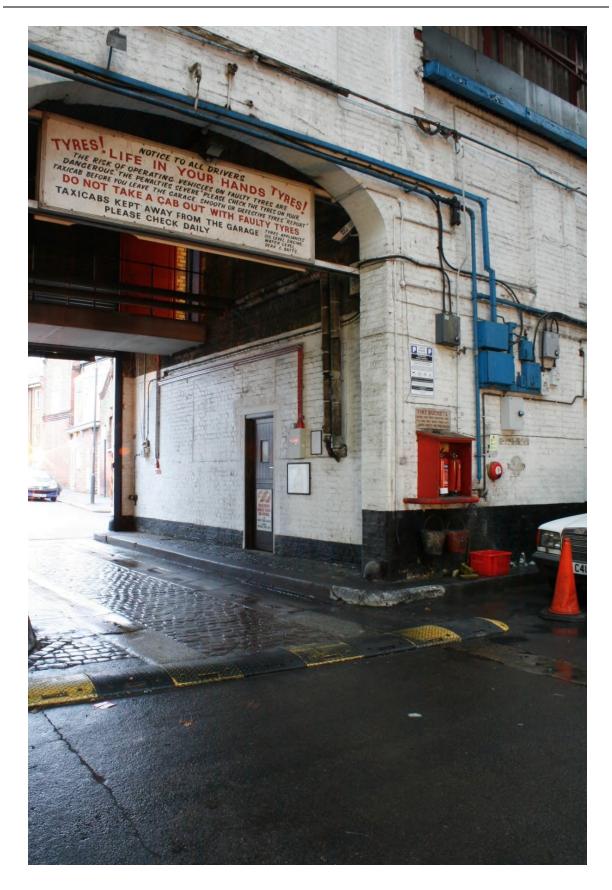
Internal view of the passageway entrance from Farm Lane into the building, looking northwest (72FmLa D100 056)
